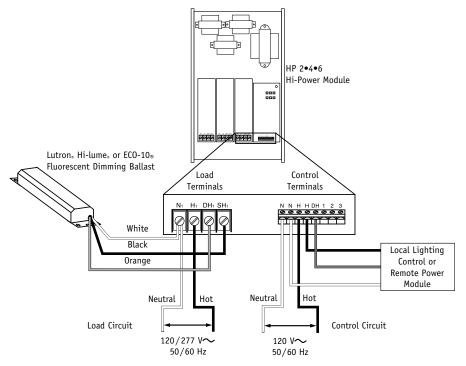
HP 2•4•6 Installation with a Fluorescent Dimming Ballast
